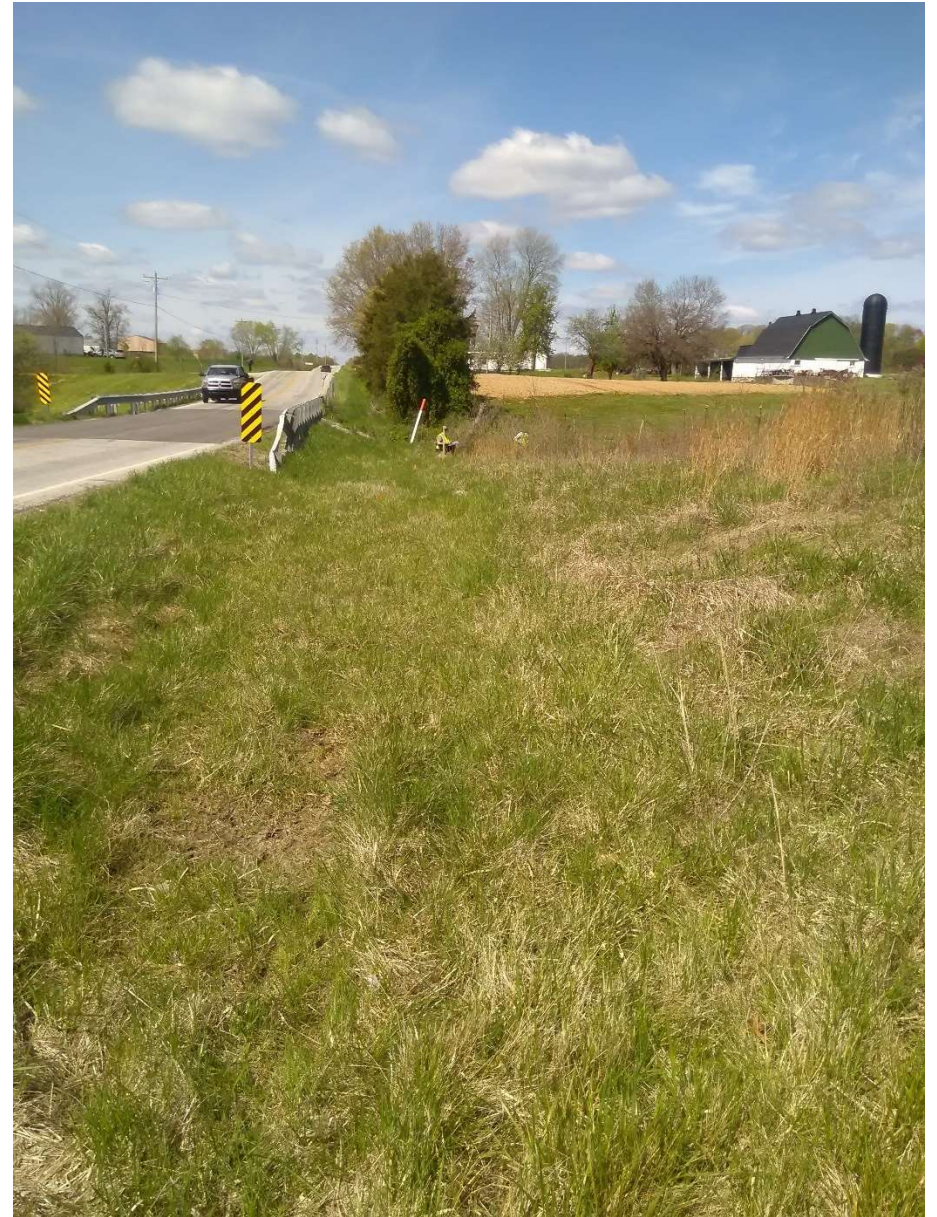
Facing west along north side of SR 250 roadside. (4.16.21)
